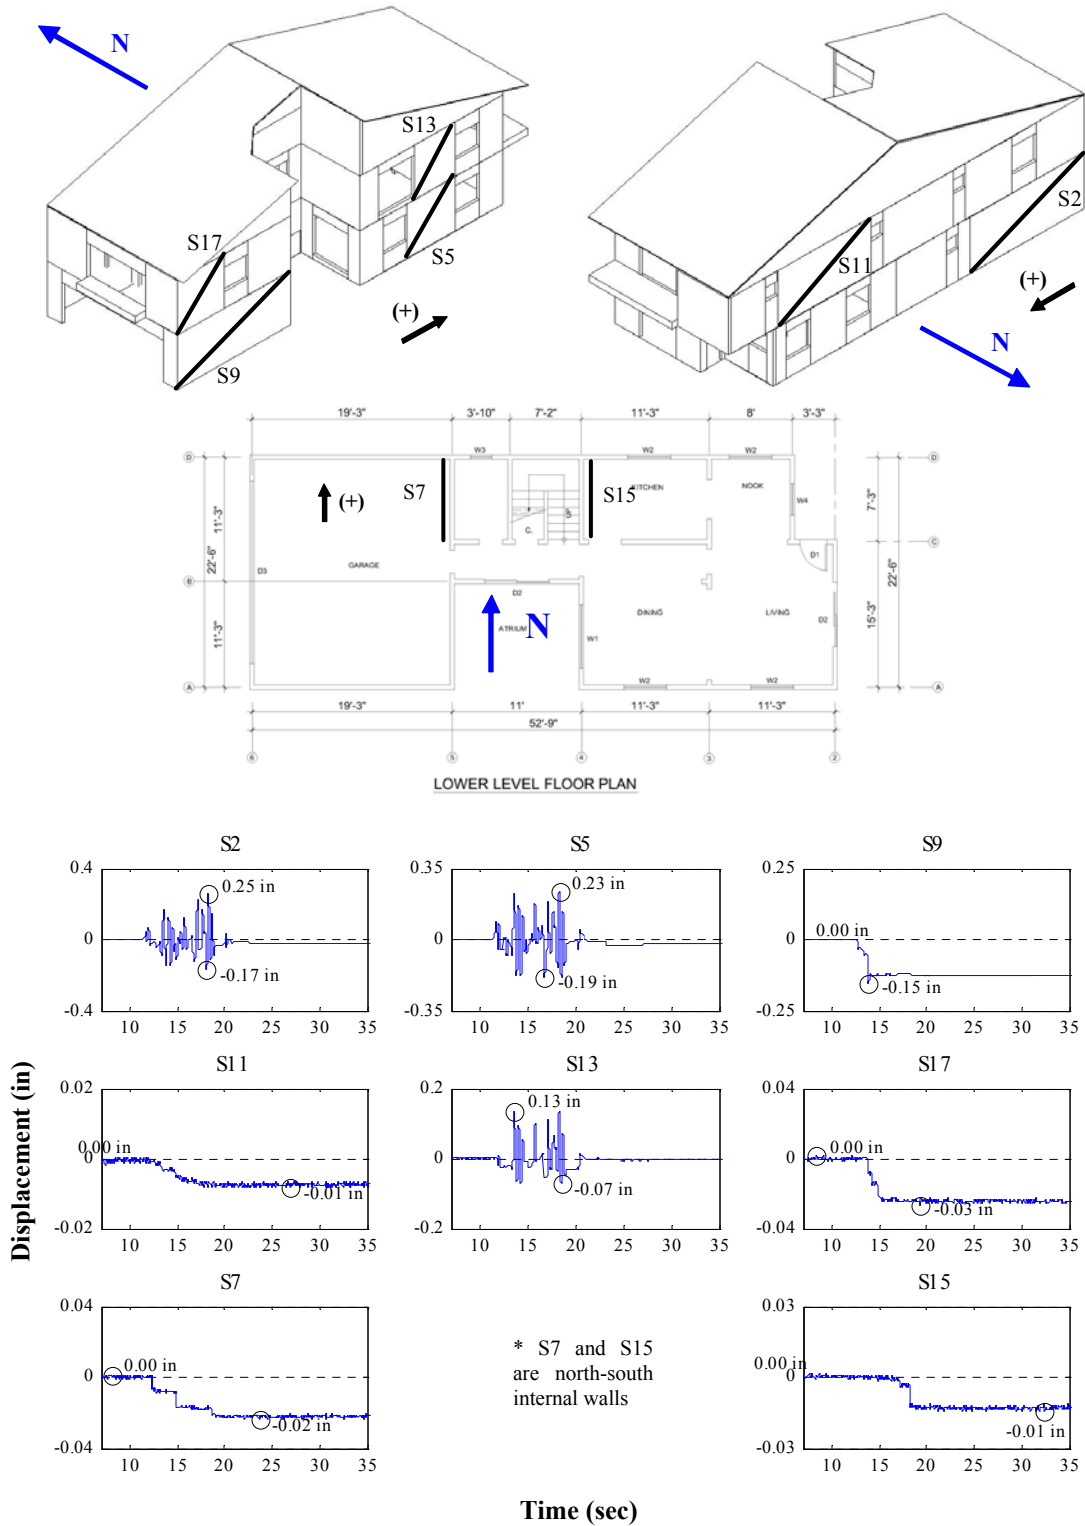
Wall deformations of east-west internal walls for Test NWP2S05
